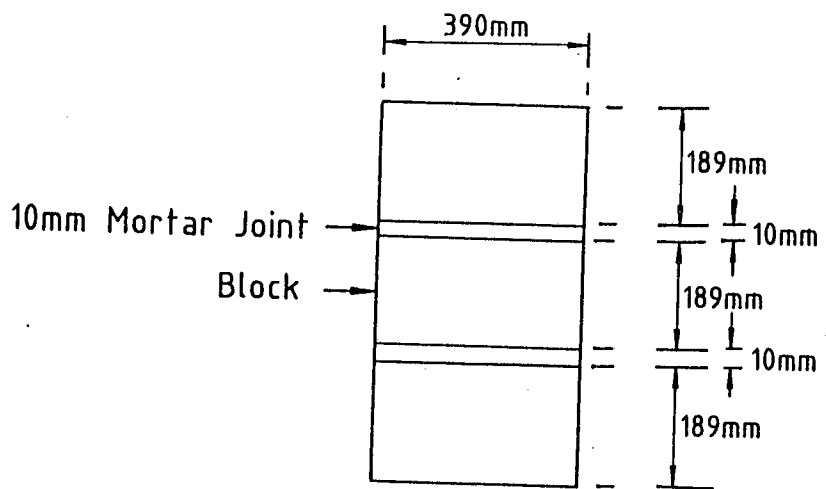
Typical stack-bonded blockwork masonry prism compressed in a direction normal to unit bed face.
